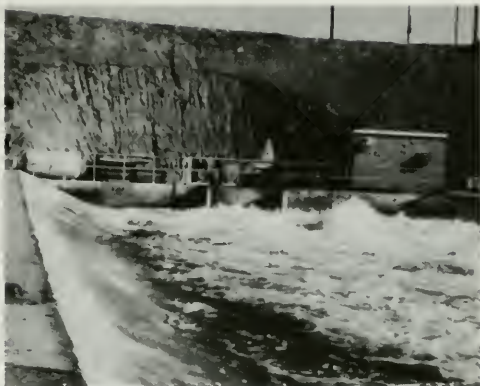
Outlet Structure—Quail Lake to Quail Canal
